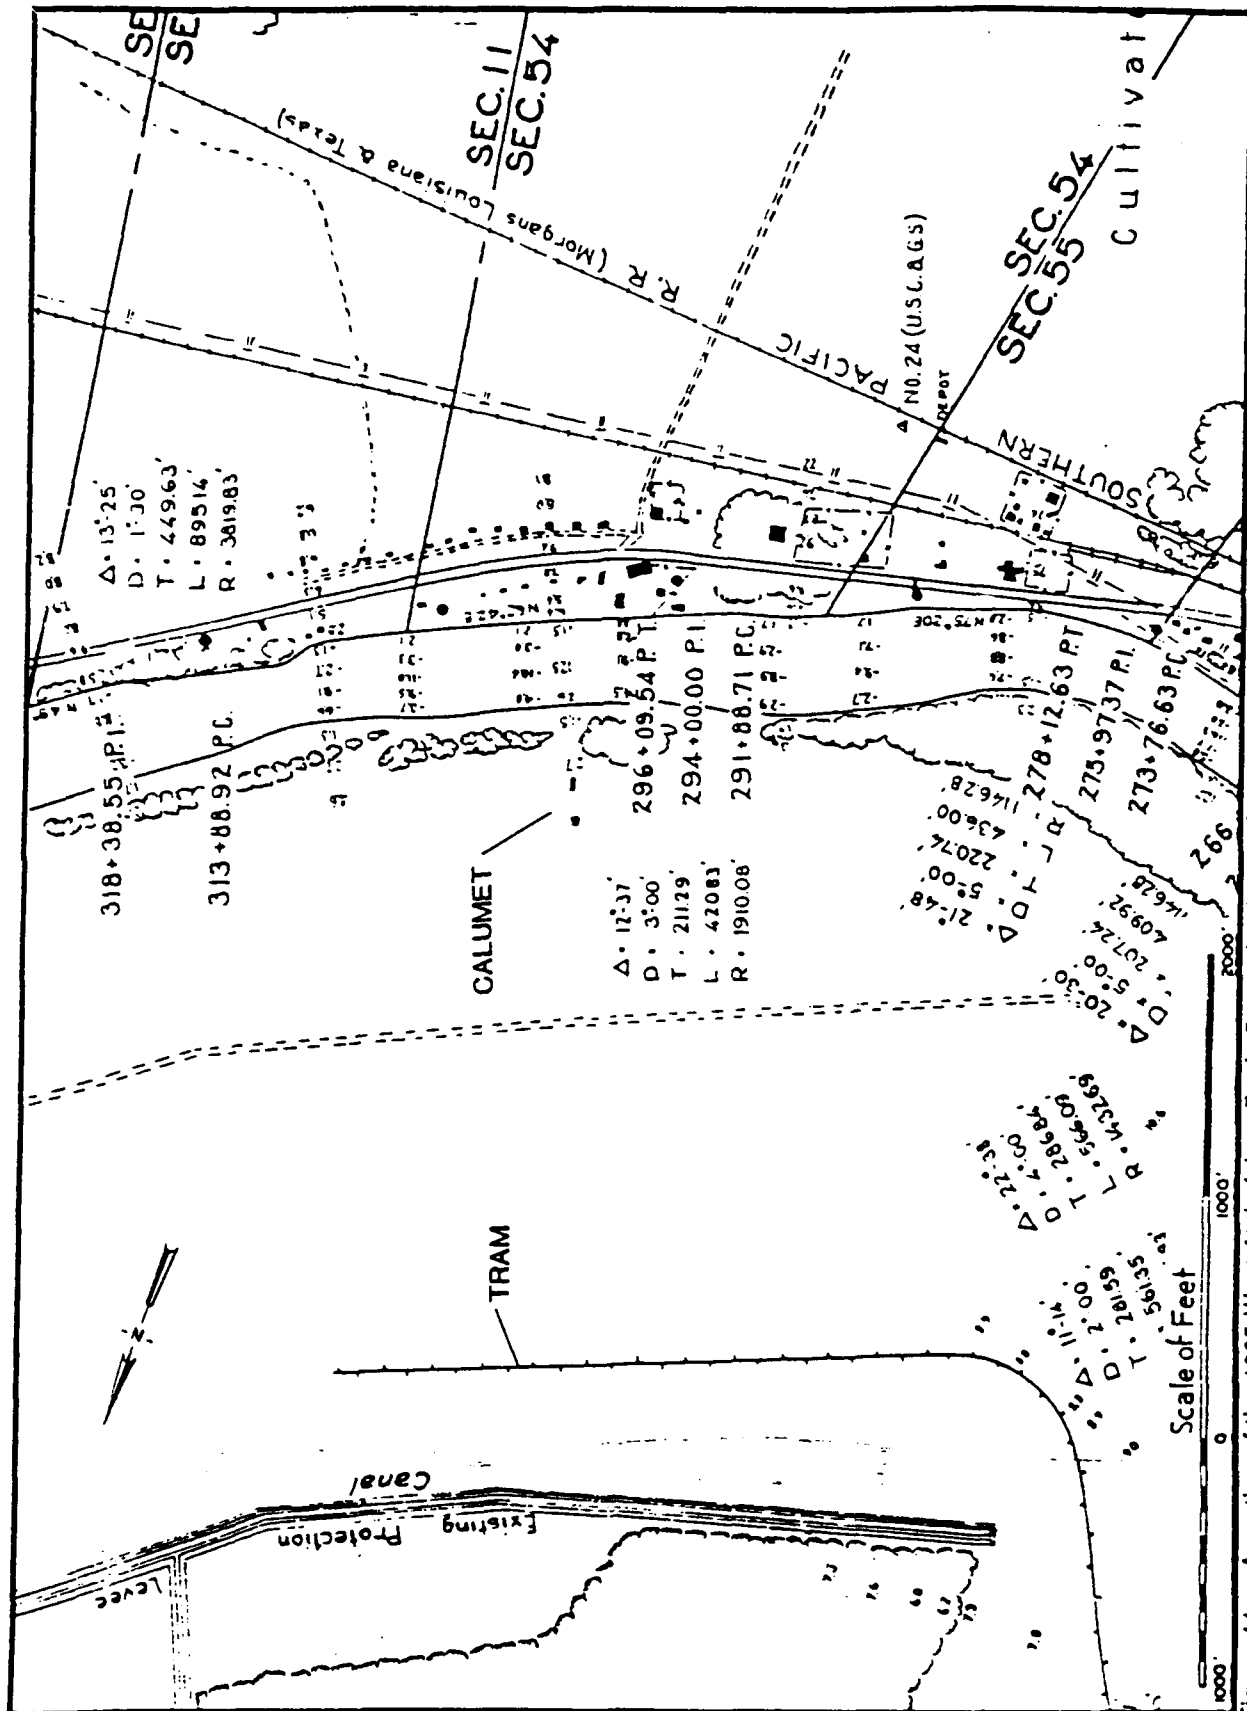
A portion of the 1935 West Archafulaya Basin Protection Levee, Bayou Teche Levee Survey (1935), U.S. Army Corps of Engineers, File H-8-12470, showing structures at Calumet (16SMY67), tram, canal, and existing protection levee.
